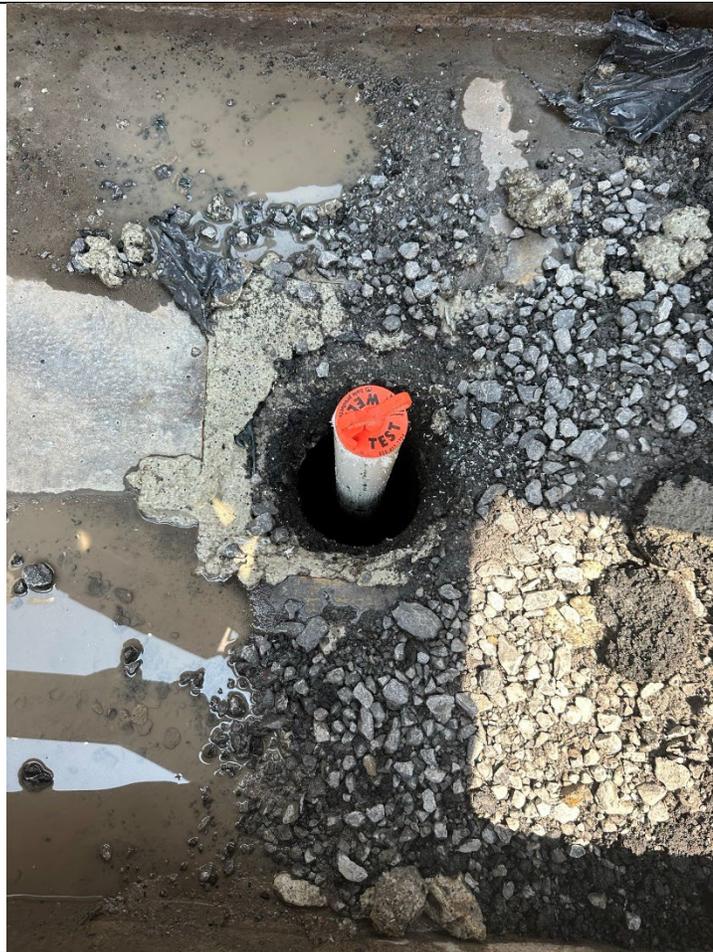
View of PVC pipe risers DB3-MW-3S, DB3-MW-3D, and DB3-MW-3 immediately after installation and grouting.
